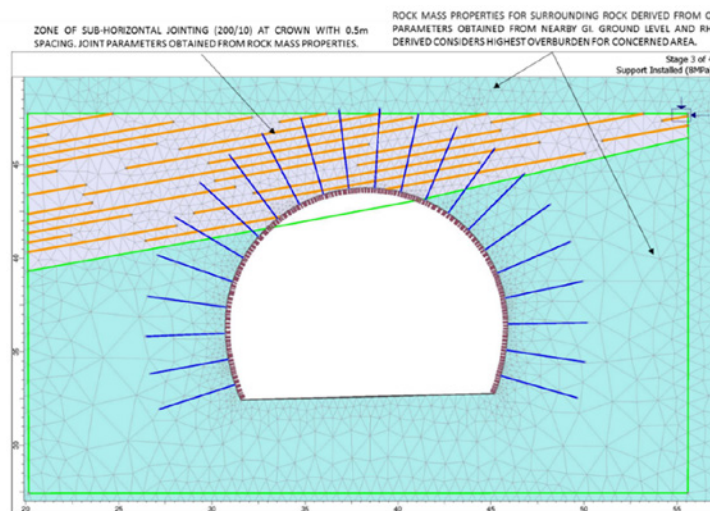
Ground model for 150mm shotcrete design with shotcrete liner and pattern rock bolts
